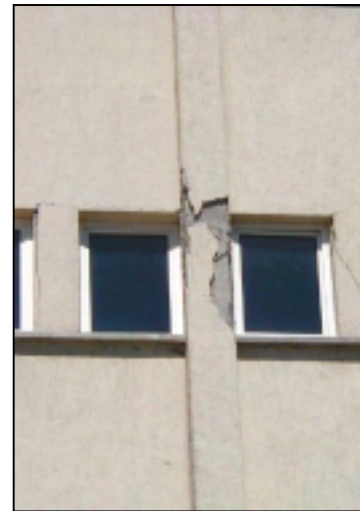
Diagonal crack in column G10 at the second story
